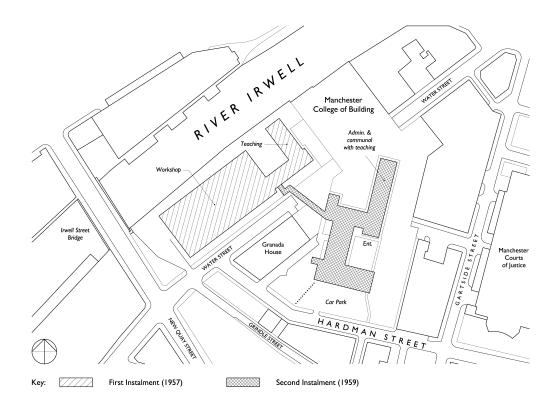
Manchester College of Building (formerly Irwell College of Further Education): site plan of complete college
